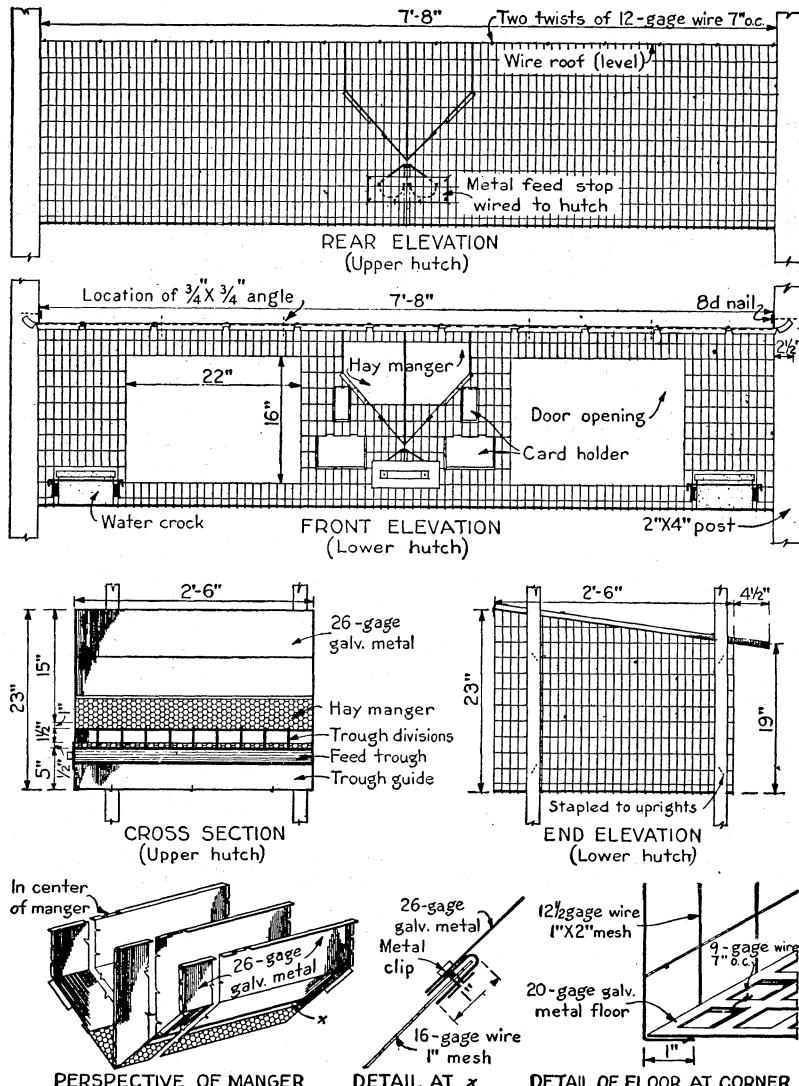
Construction details for all-metal rabbit hutch. (Prepared by the Division of Farm Buildings and Rural Housing, Bureau of Plant Industry, Soils, and Agricultural Engineering.)
